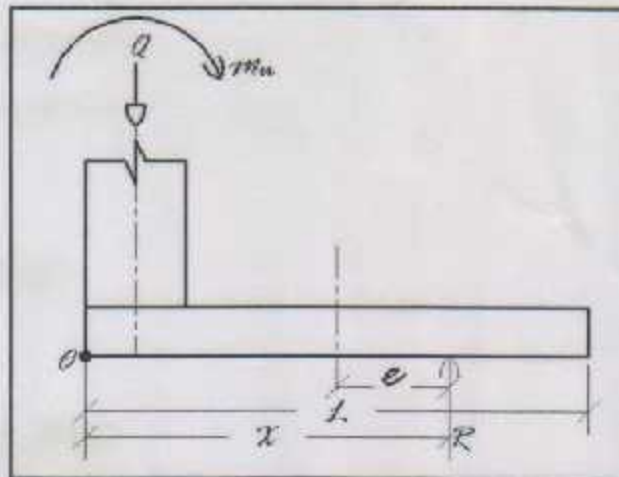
Eccentricity from center of footing - Exterior frame footing
